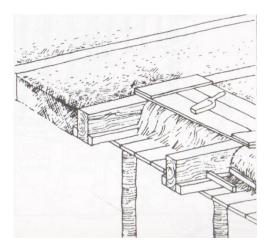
Lightweight straw floor application. Source: Houben and Guillaud, 2008
